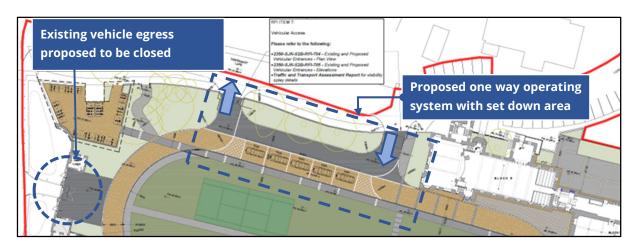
Proposed Site Layout with Proposed Vehicle arrangement
